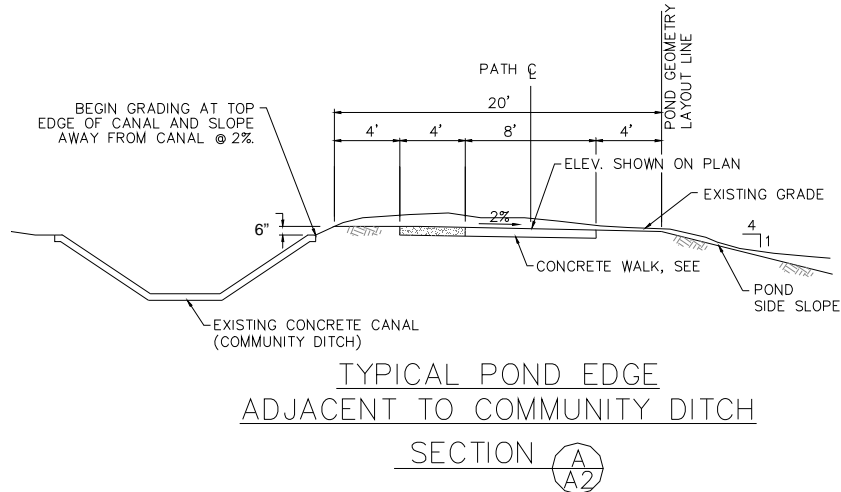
Typical Pond Edge Adjacent to Community Ditch
